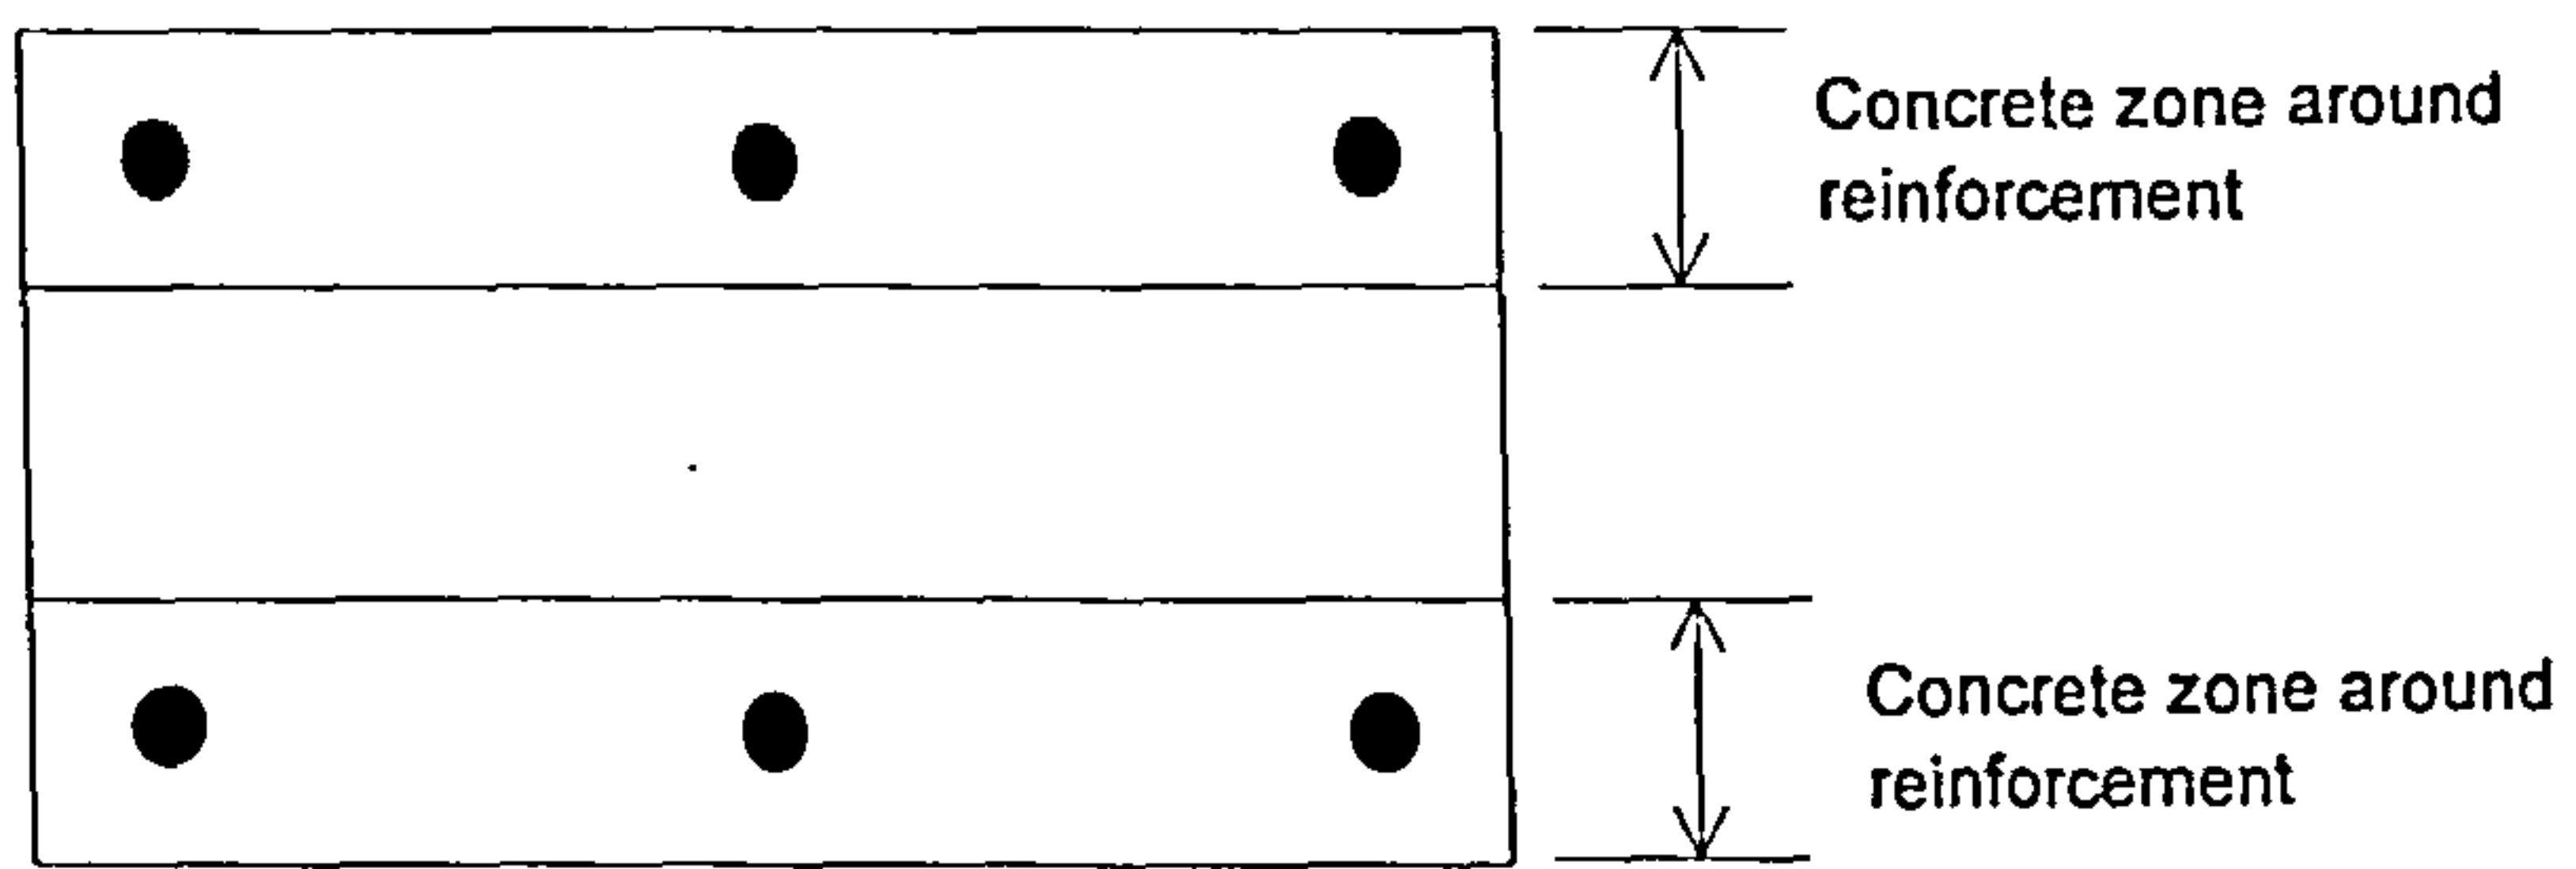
Zone of concrete around reinforcement to model tension stiffening
